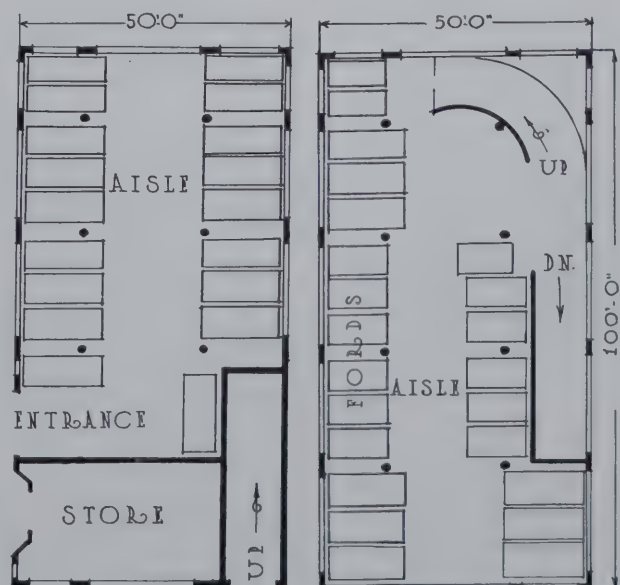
First and Second Floor Plans Showing Efficient Design of Ramp in Narrow Building
